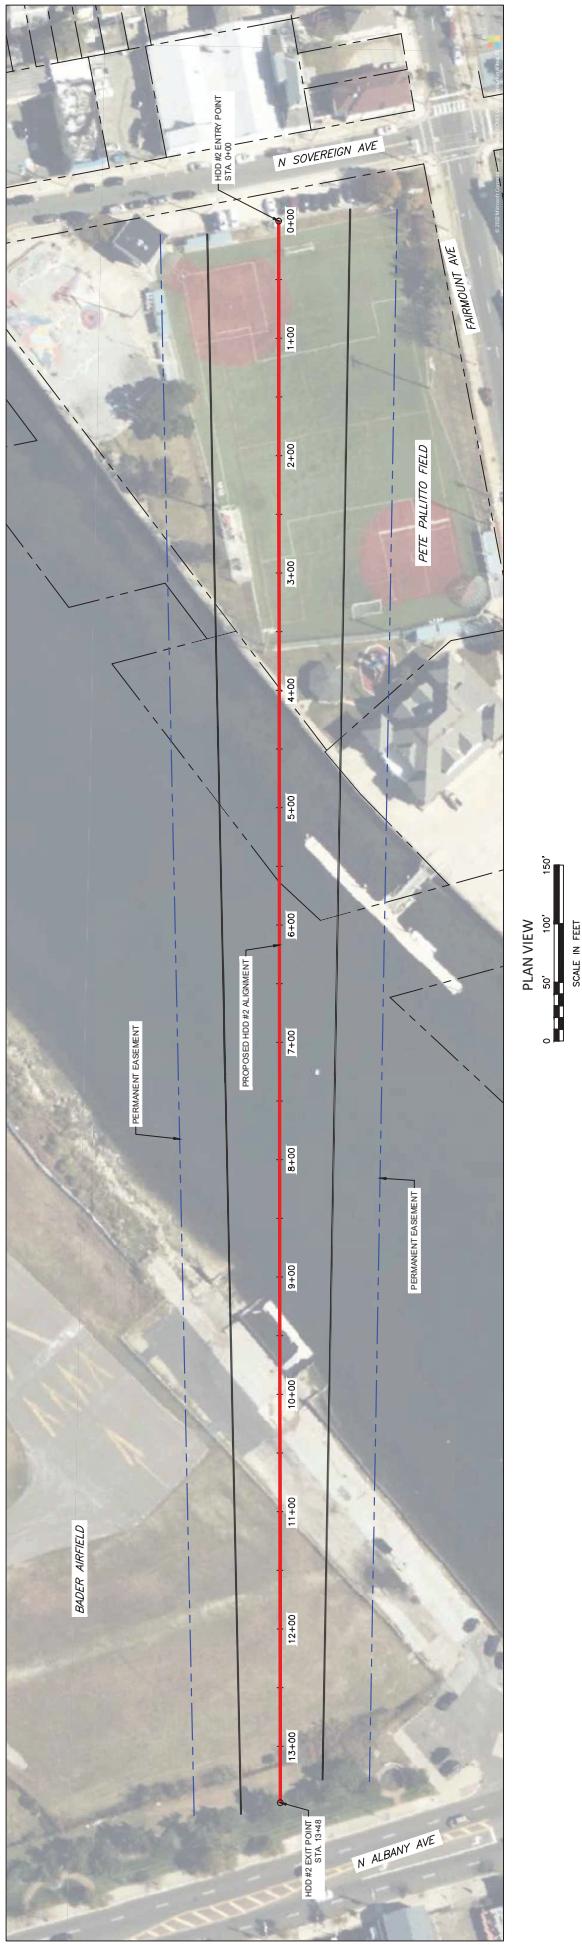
Inside Thorofare Crossing HDD Plan & Profile
